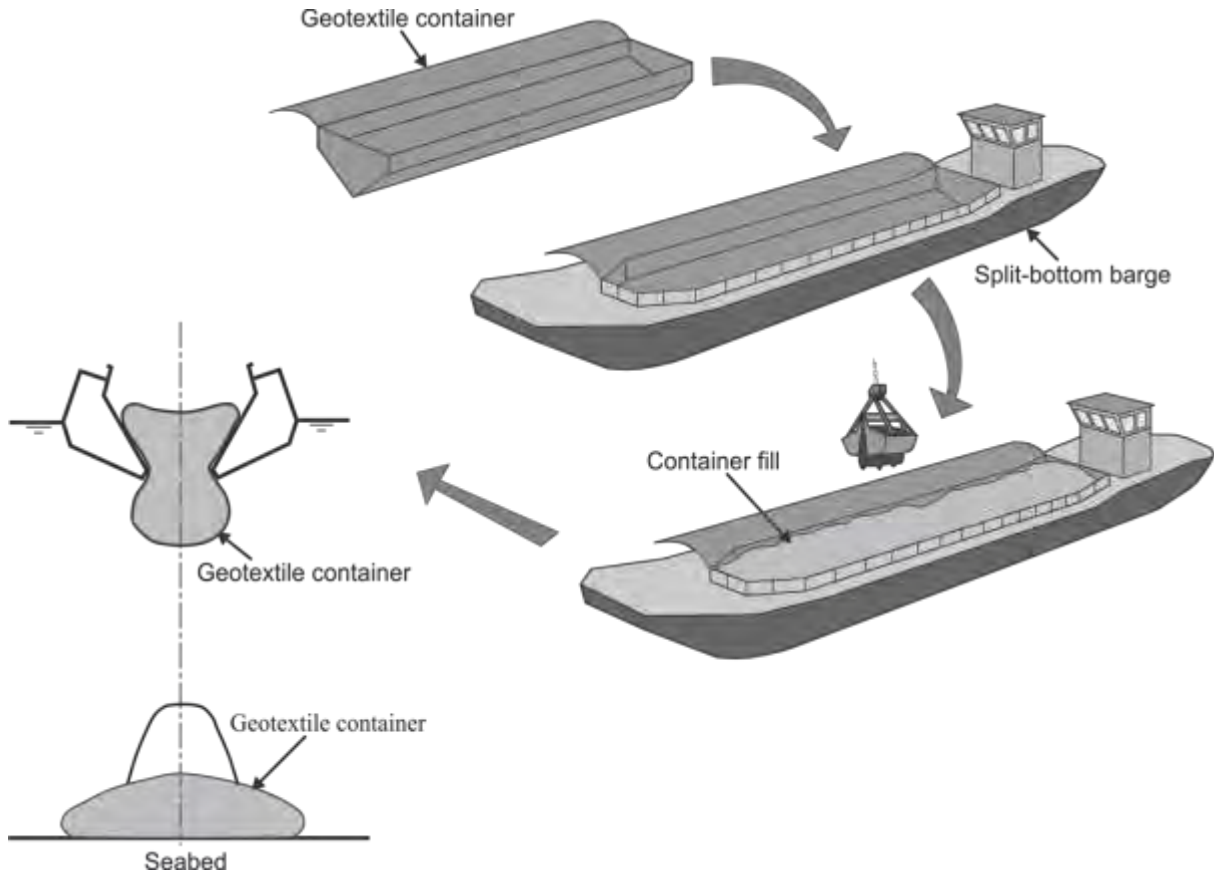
Installation procedure for geotextile containers (After Pilarczyk, 2000).
